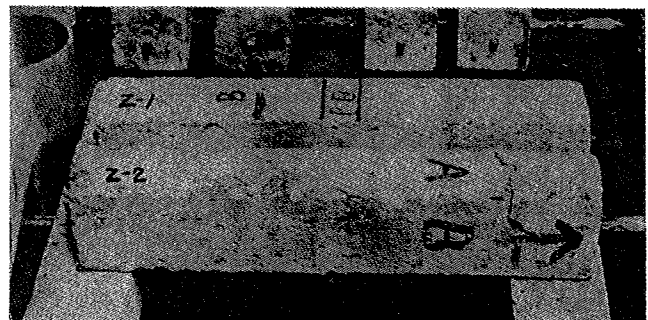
Concrete specimens Z-1 and Z-2 after autoclave testing.
